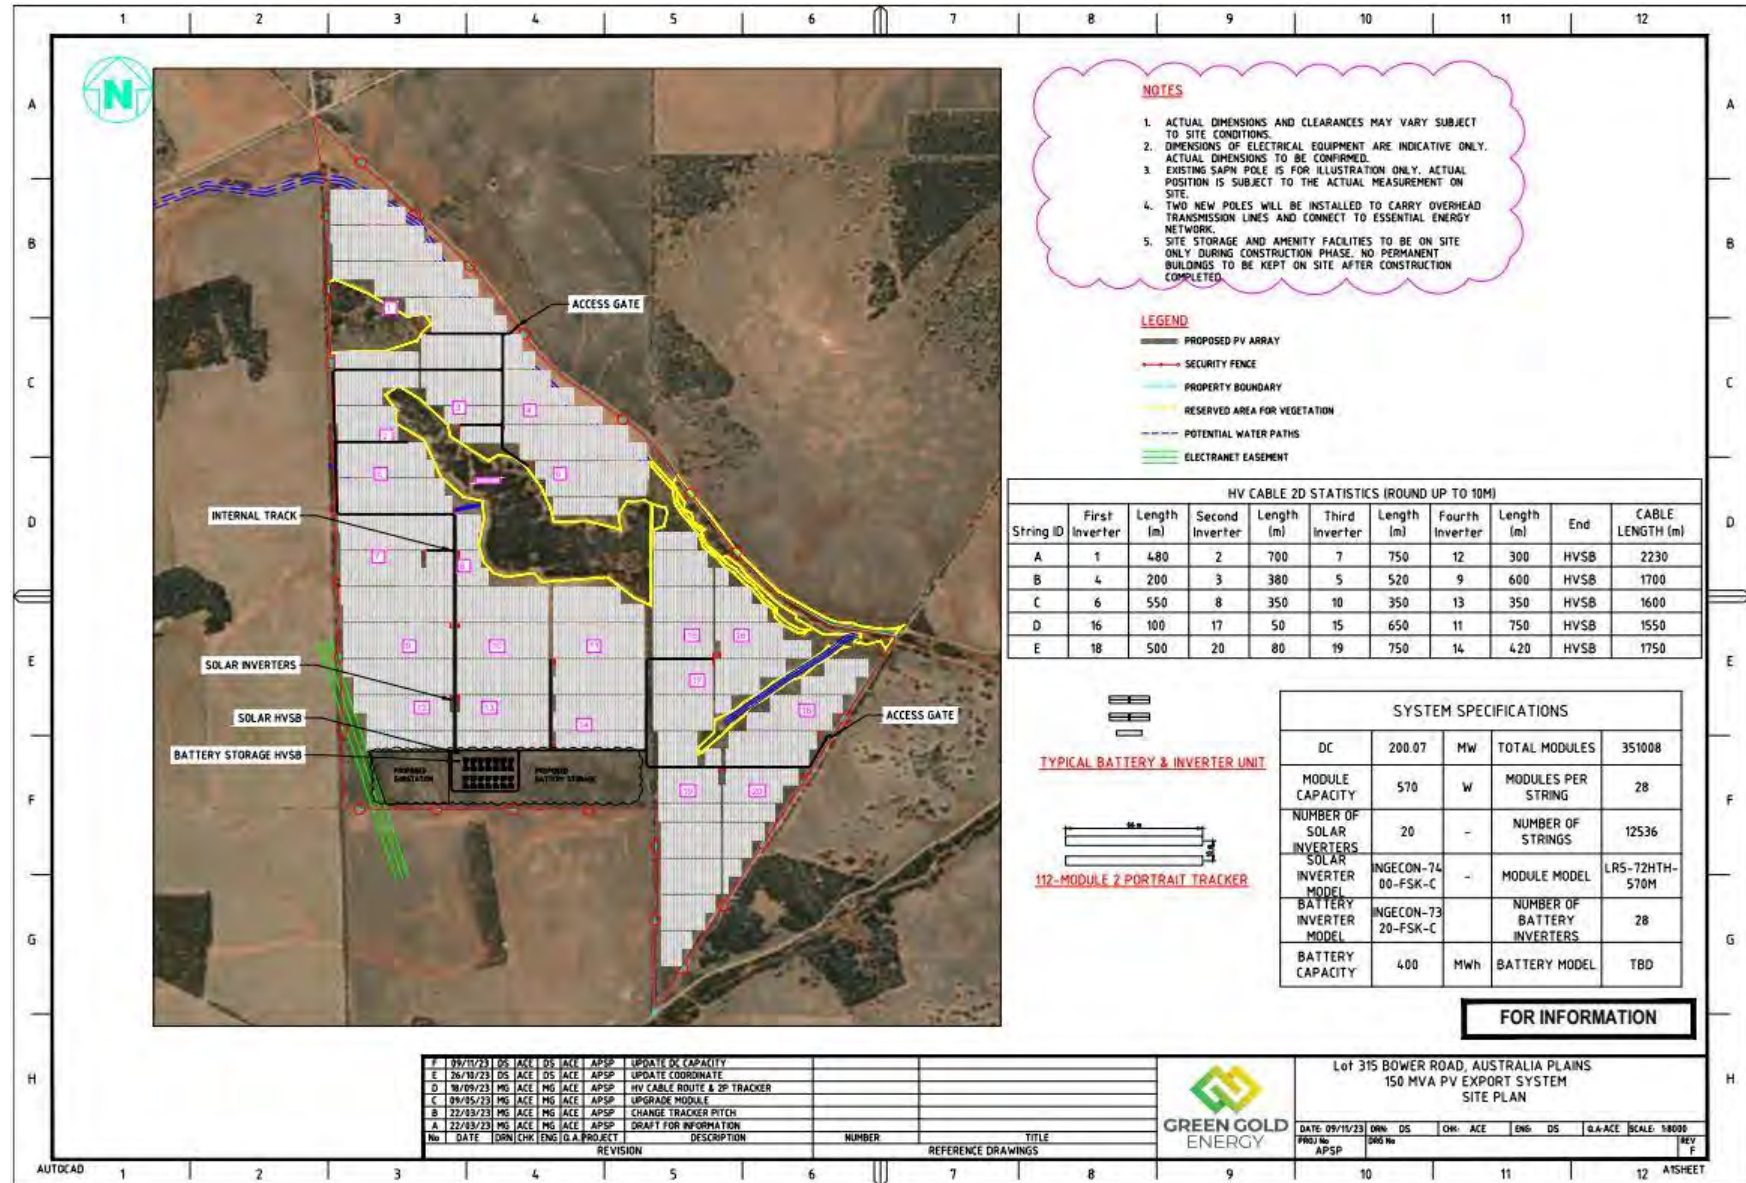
Site Plan provided by GGE (supplied to EBS on 15/01/2024).
